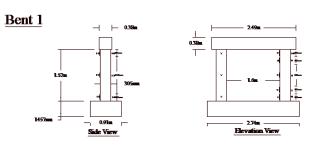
FBG crack sensors on the bridge piers (Bassam, et al, 2011).
